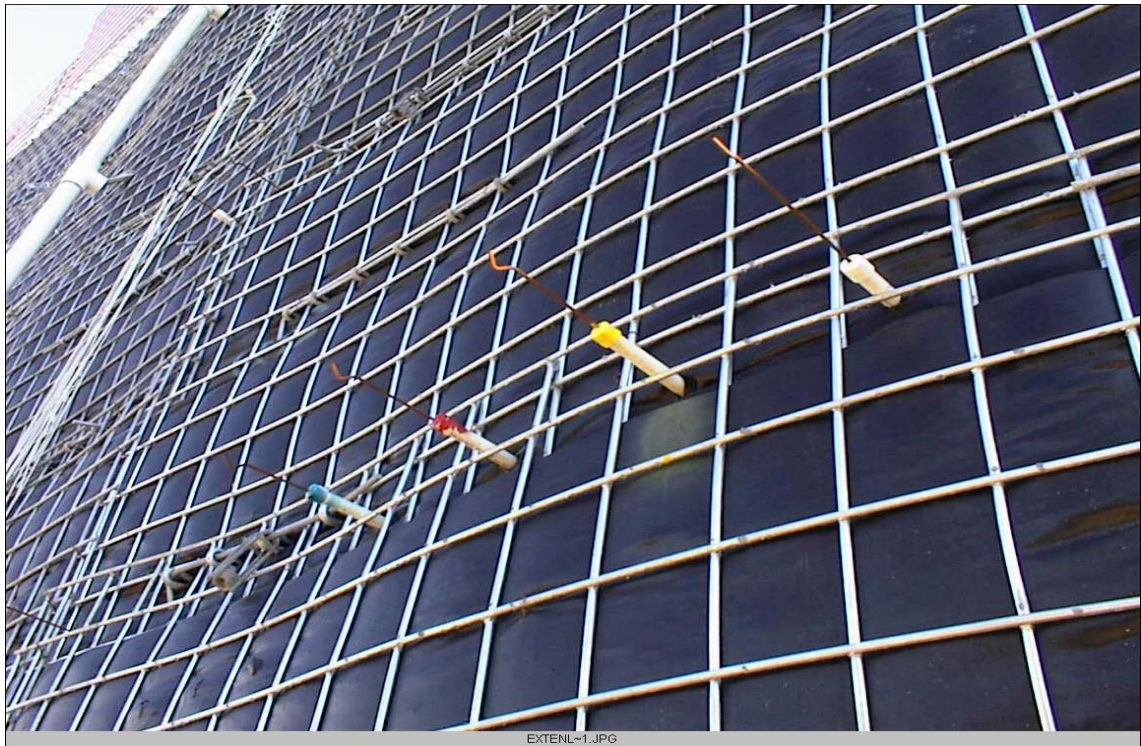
Photograph showing horizontal extensometers protruding from wall face.
